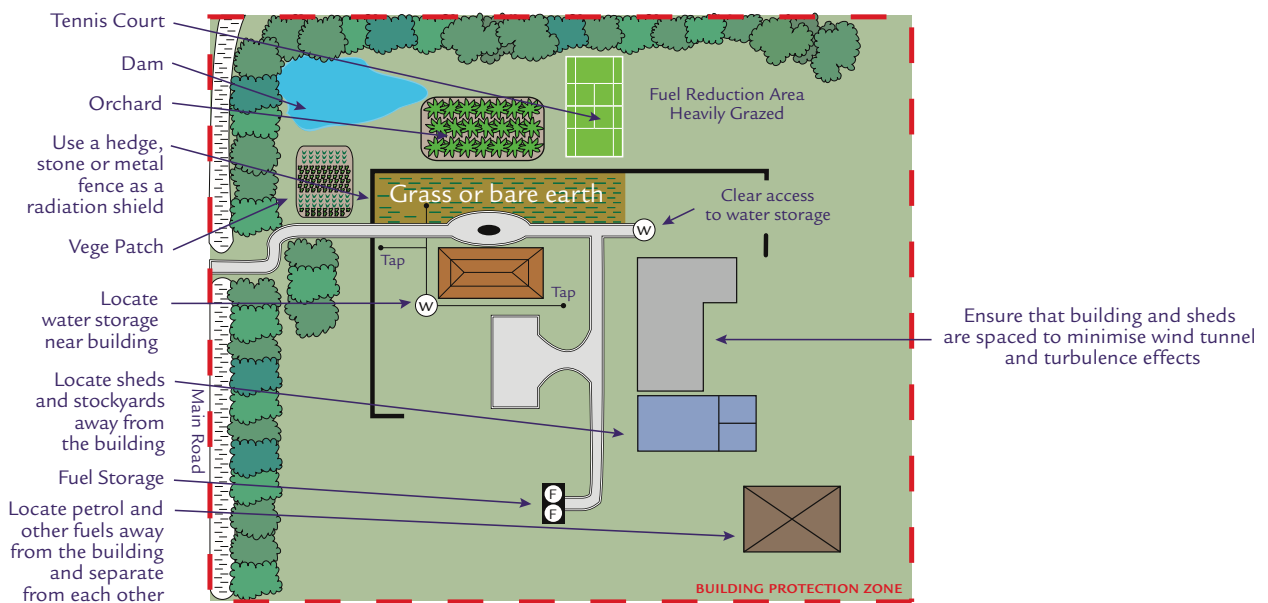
Lot layout showing a building, surrounded by a Building Protection Zone (see also Figure 11).
